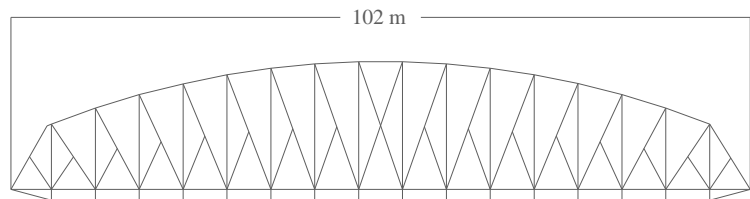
Superstructure steel truss of the Infiernillo II Bridge
